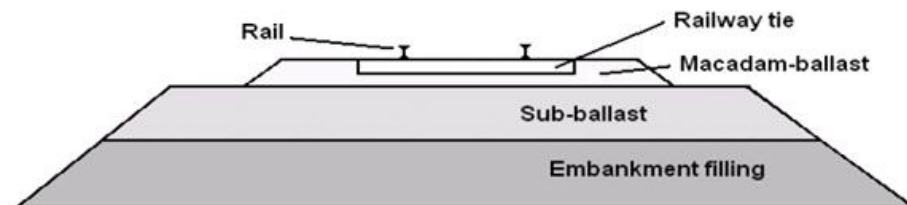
Cross-section of a typical railroad.<sup>11</sup>
